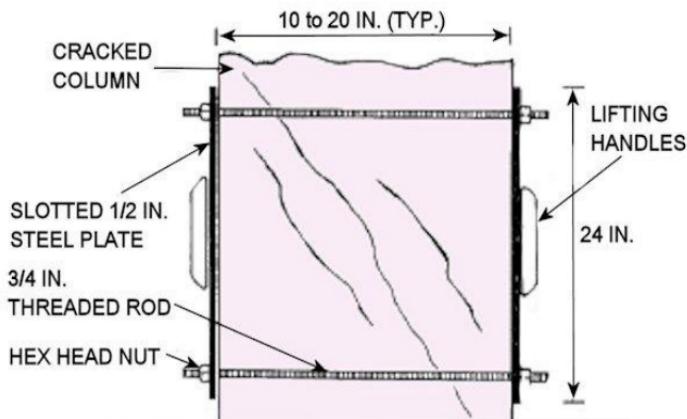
Steel Plate Splint Installation on Cracked Column.
